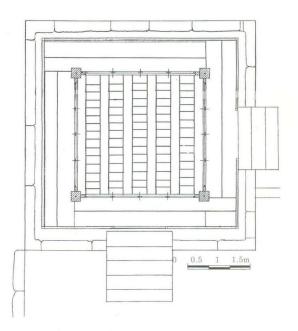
Nungsujung Floor Plan (N. Zu 2003)
